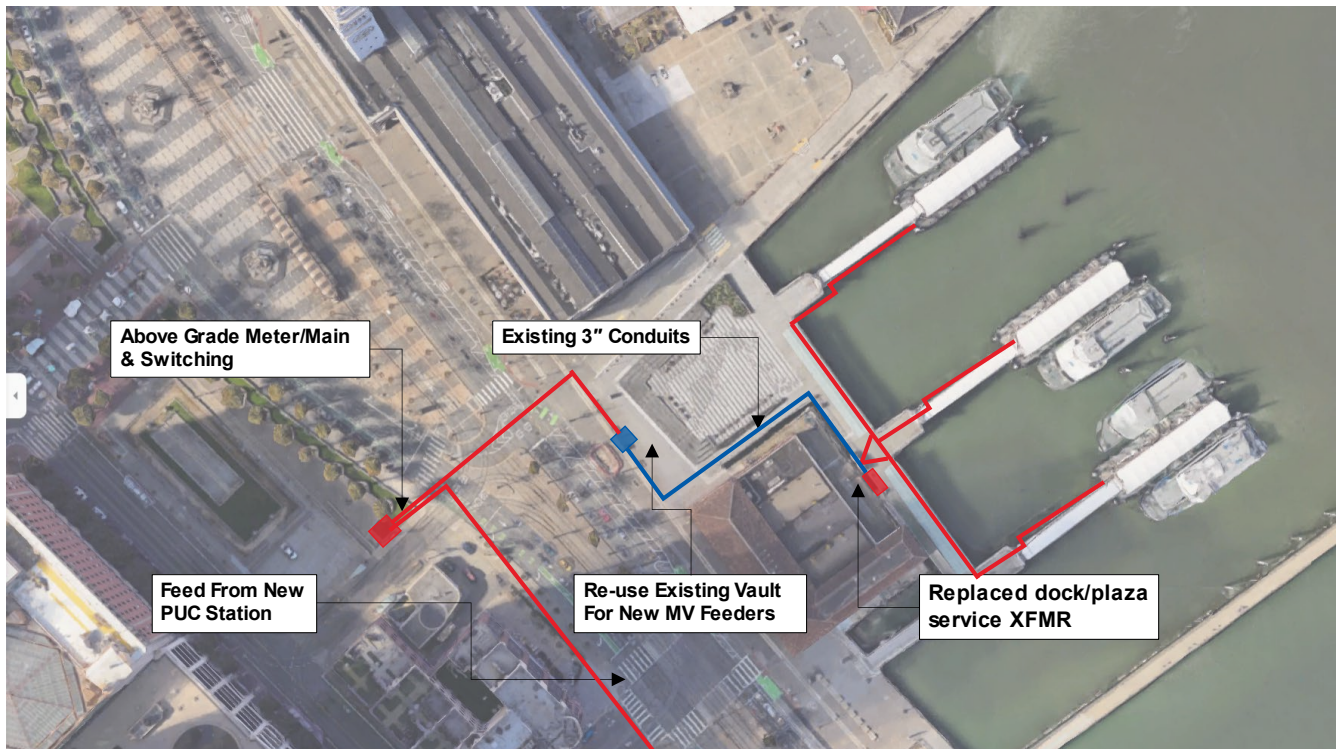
Utility Point of Connection & Switching West of Embarcadero Credit: Arup
